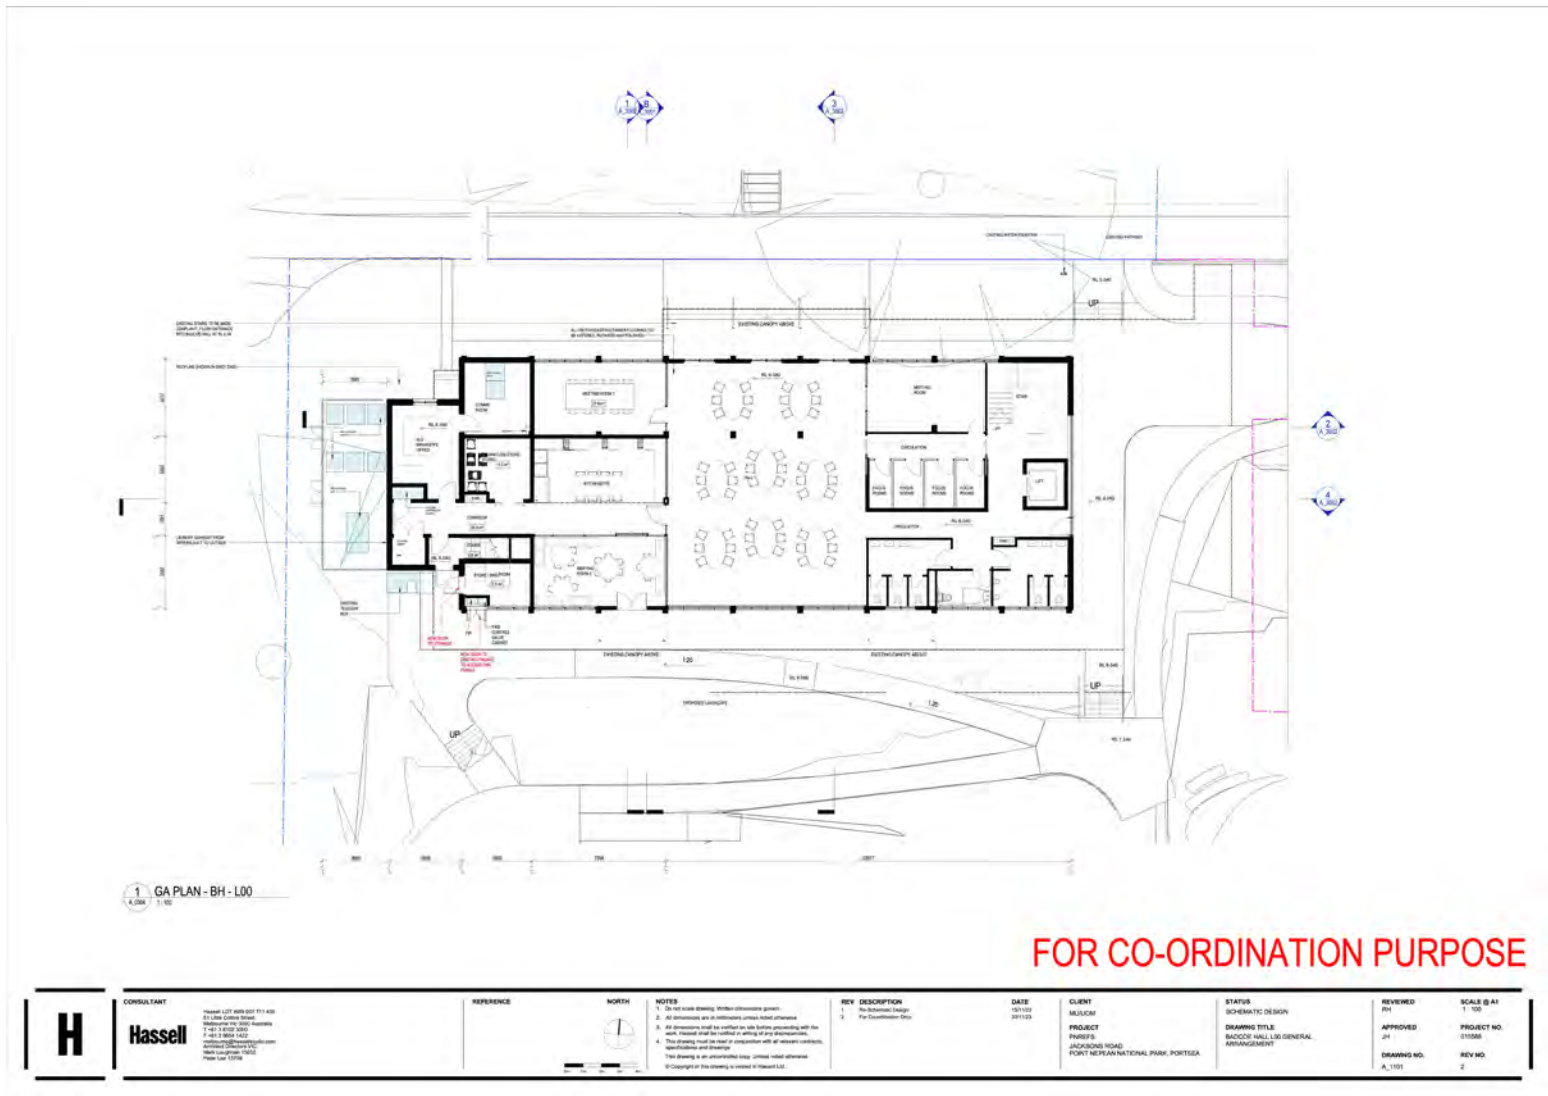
Development Plan showing proposed adaptive reuse (ground floor) of Badcoe Hall. Document provided by UoM.
